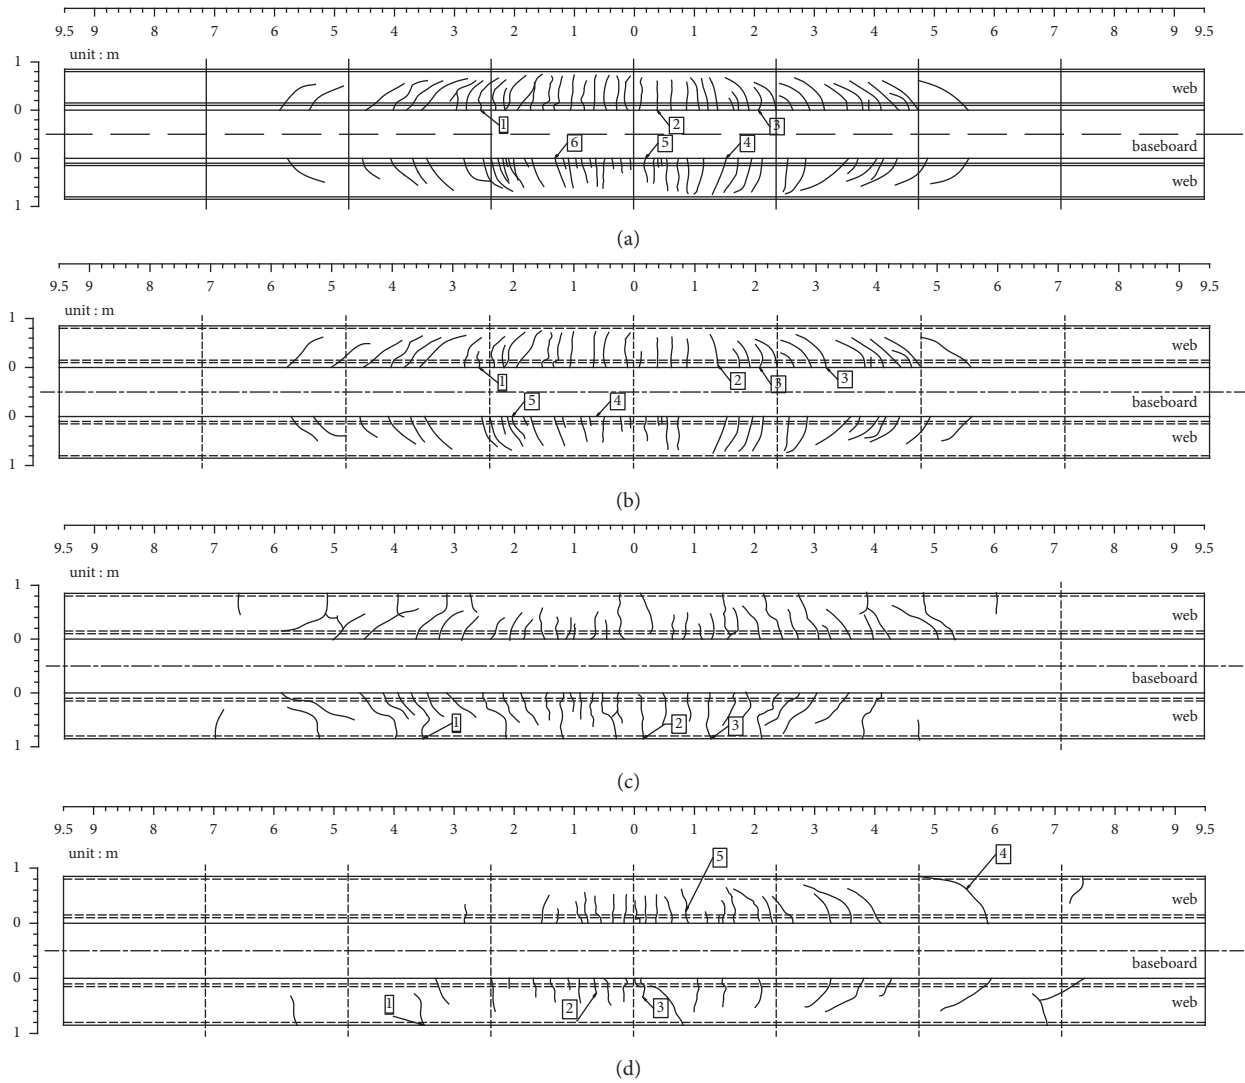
Schematic diagram of cracks at the end of limit loading. (a) Beam 2#. (b) Beam 3#. (c) Beam 4#. (d) Beam 5#.
